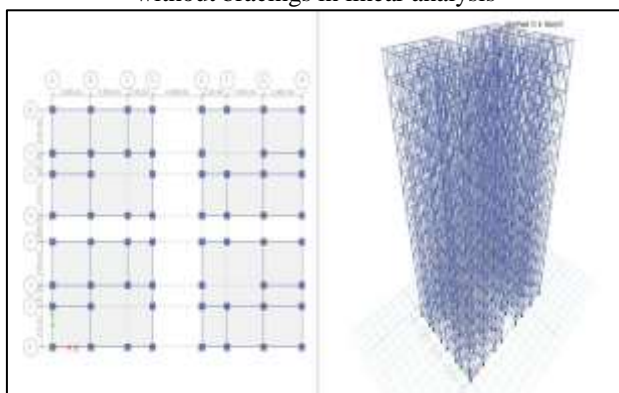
Model showing plan 3d view of high rise building with bracings in linear analysis
